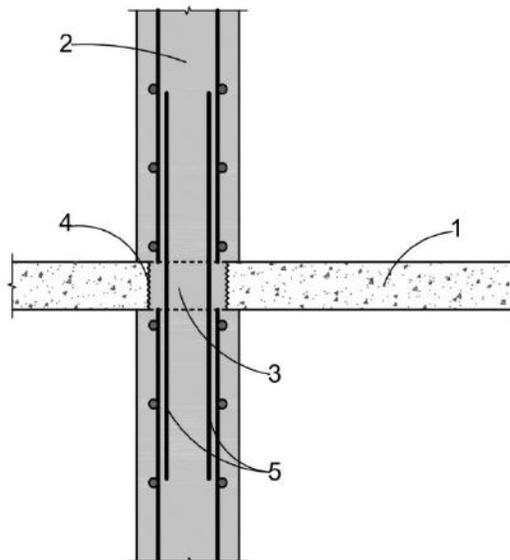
Shear wall connection to the existing RC slab: 1- existing RC slab; 2- new RC shear wall; 3- a hole in the existing slab for passing the longitudinal wall reinforcement; 4- roughened interface between the existing and new concrete; 5- longitudinal dowels passing through the hole (based on FEMA 547, 2006).
